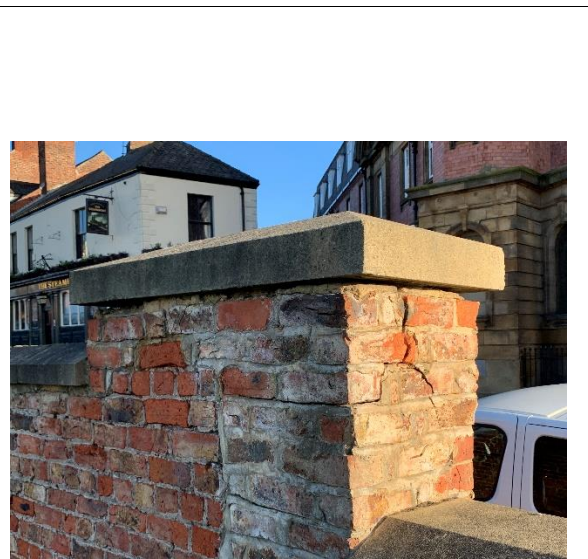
Wall Section 2, rear face has been repaired and rebuilt in local sections. Joint not bonding through
